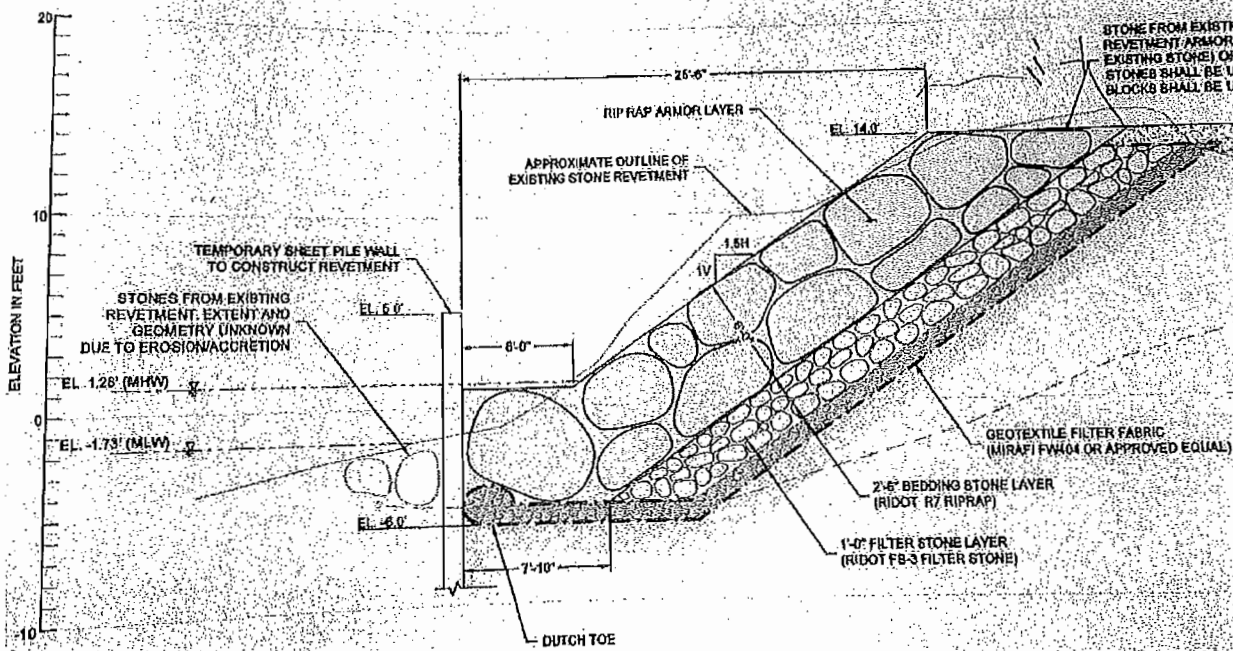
Proposed Cross-Section of Town and Hang Ten maintenance application
